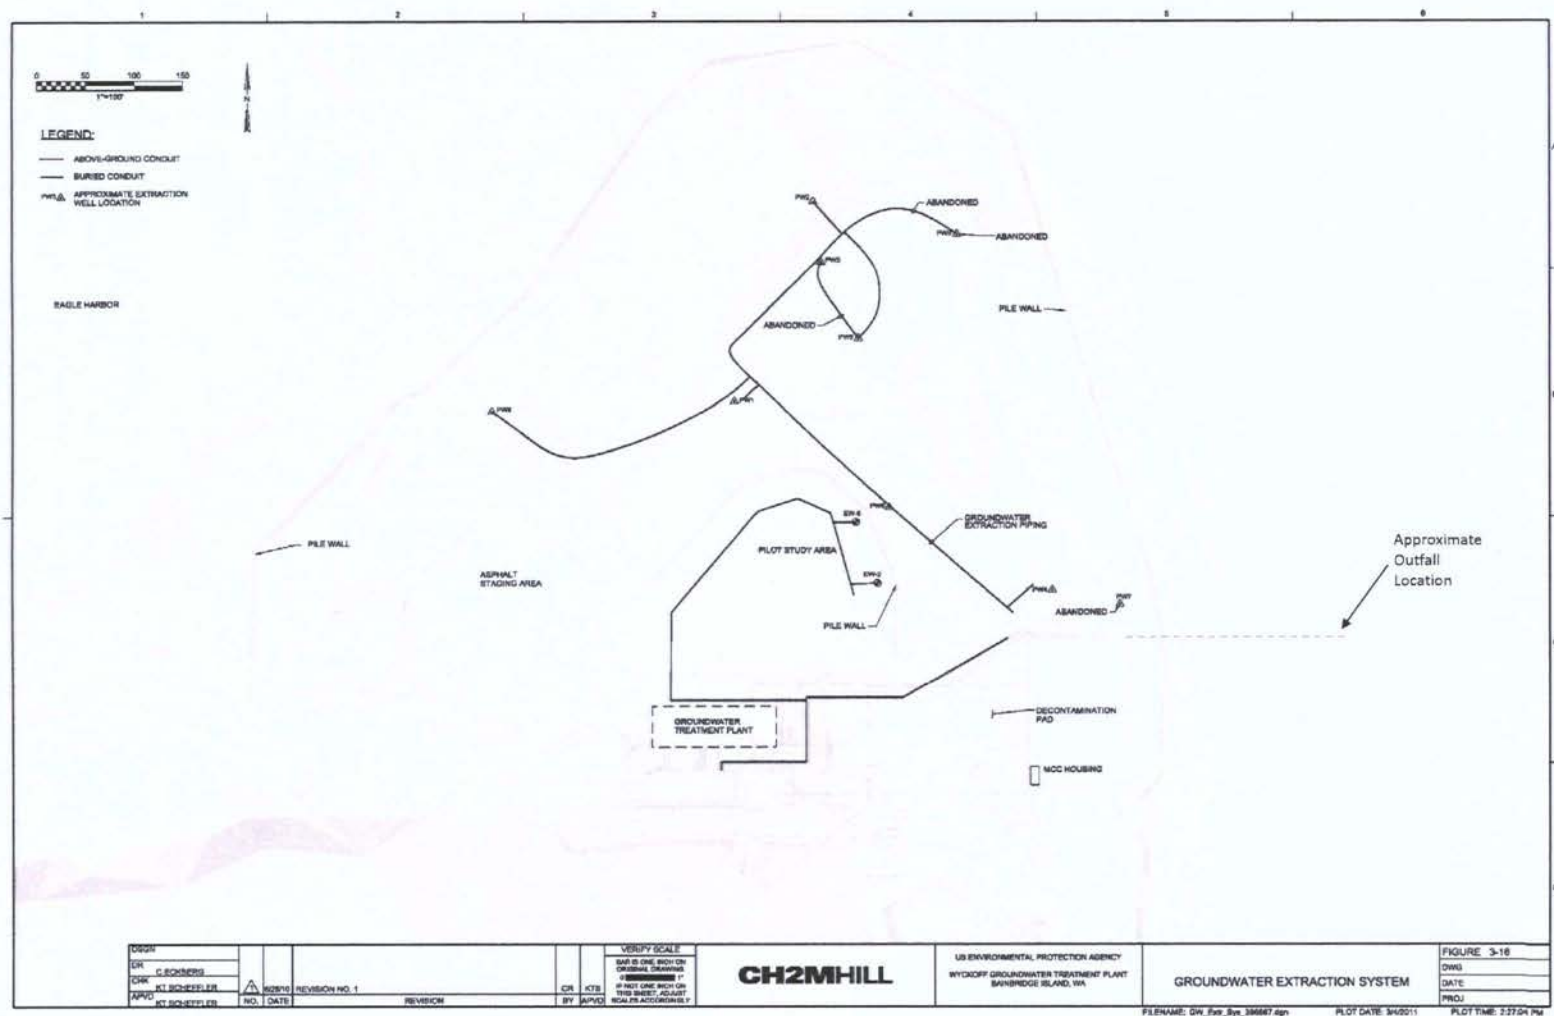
Soil and Groundwater OU New Treatment Plant and Extraction Well Locations
